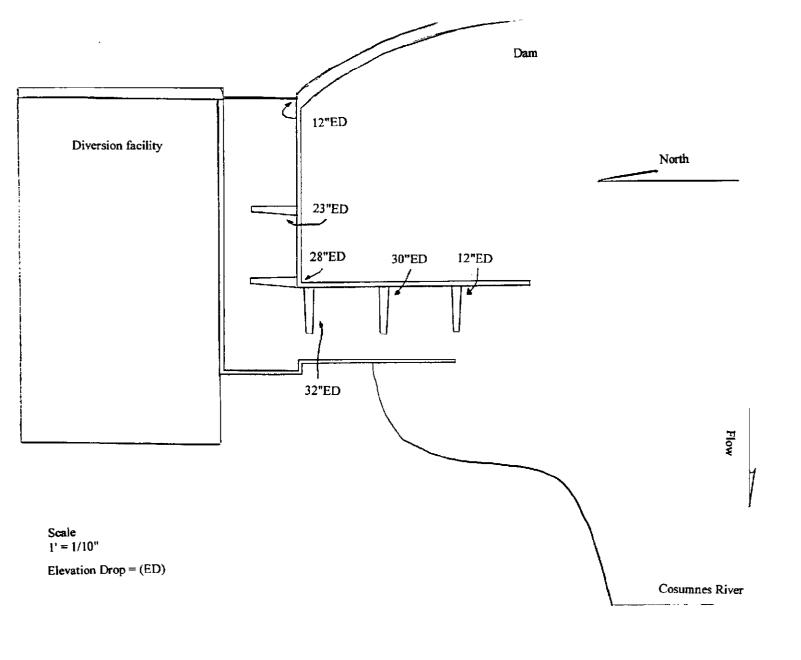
Existing right bank fish ladder at Granlees Diversion Dam, Rancho Murrieta, CA. Ladder specifications do not meet current NMFS or CDFG hydraulic criteria. Note elevation drops up to three times the maximum suggested jump height of 12 inches. Also note the proximity of the exit pool to the diversion intake.
